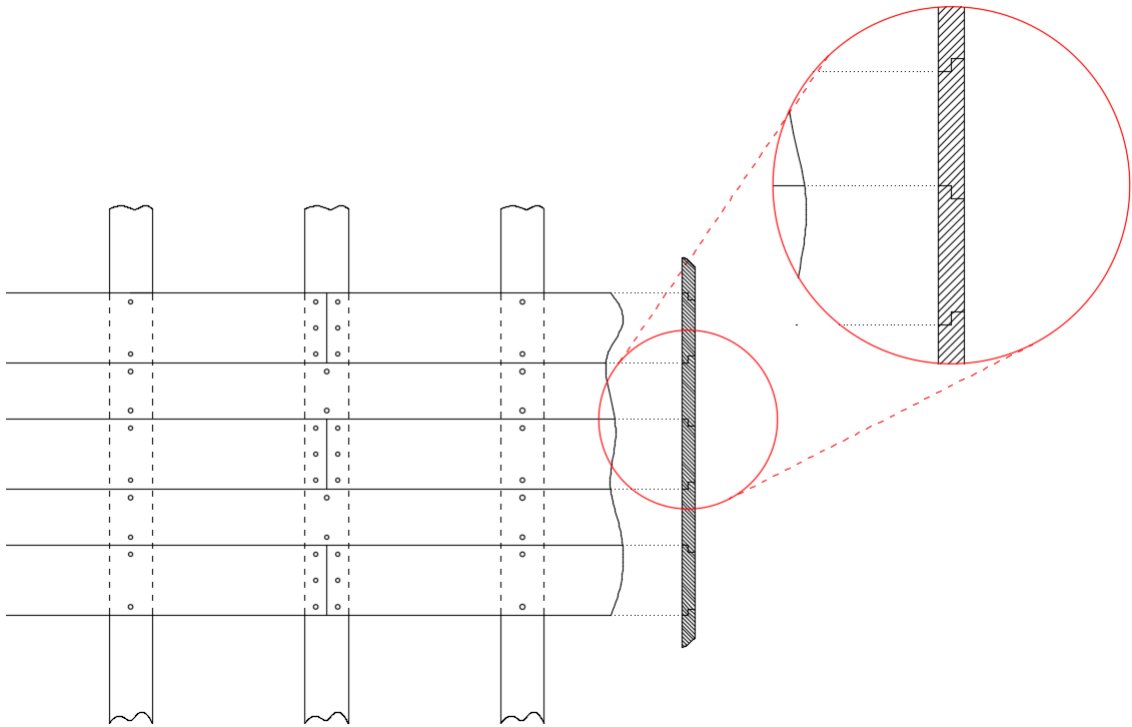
Soalho à Portuguesa* – Schemactic connections and wood board layout – Adapted from (Augusto Leitão, 1896)
